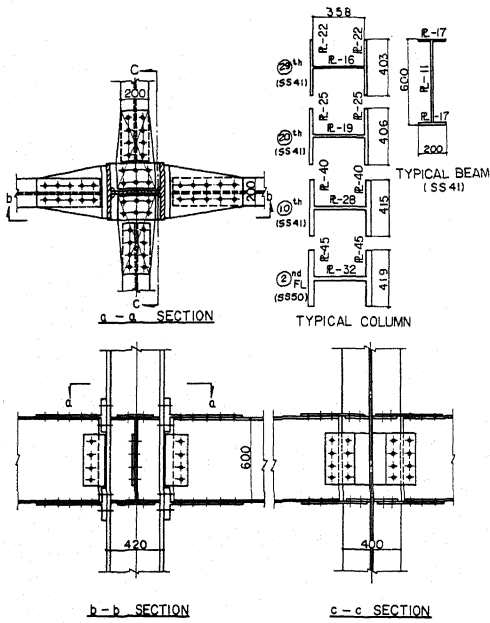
TYPICAL STRUCTURAL MEMBERS AND CONNECTIONS
